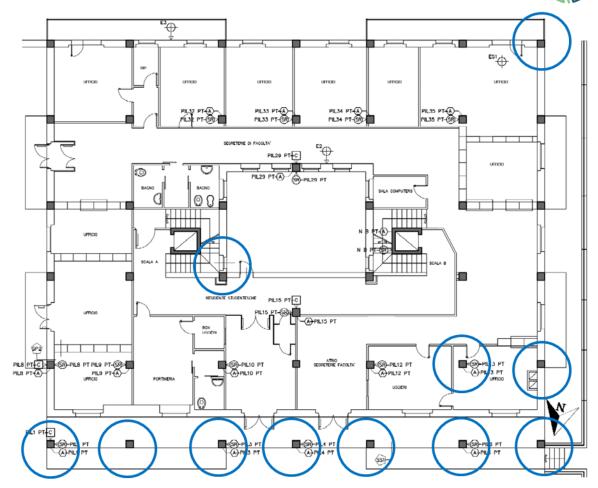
Location of NDT at ground floor of Palazzo Fazzini
